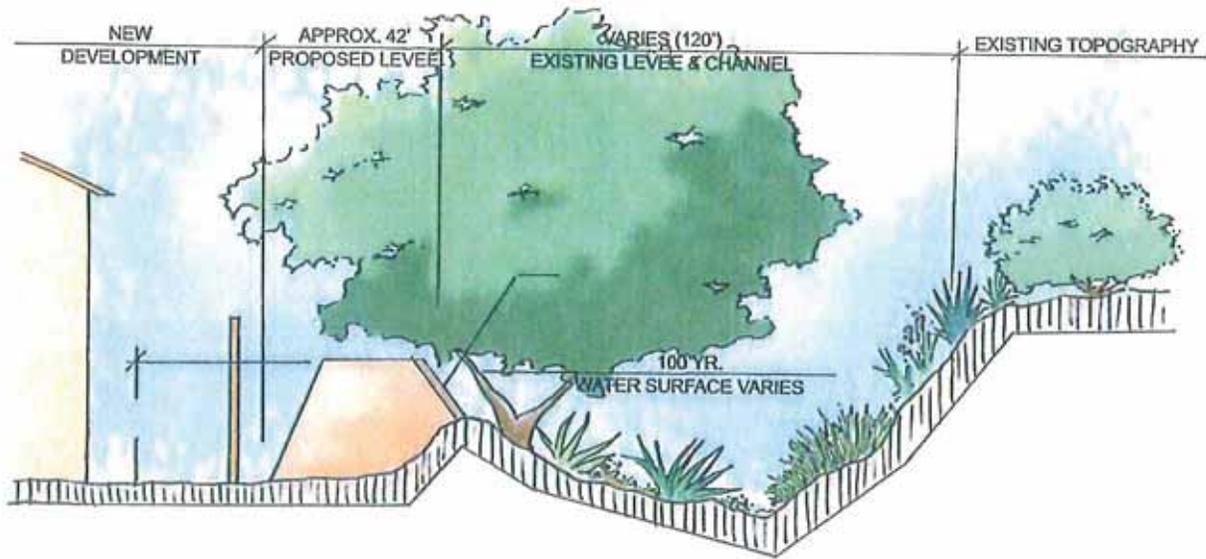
Typical Section D-D North Boundary Channel and Levee
